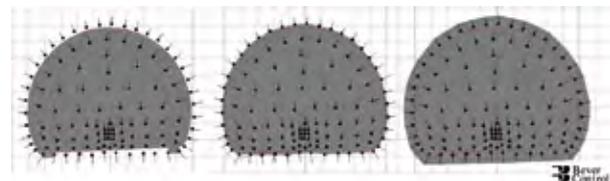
Typical BeverControl drill plan and drill report. Lofast tunnelling project. Left: Theoretical blasting cross section (63.12 m2). Middle: Collaring cross section (68.43 m2). Right: Cross section at the bottom of the holes due to eccentricity (85.03 m2).
